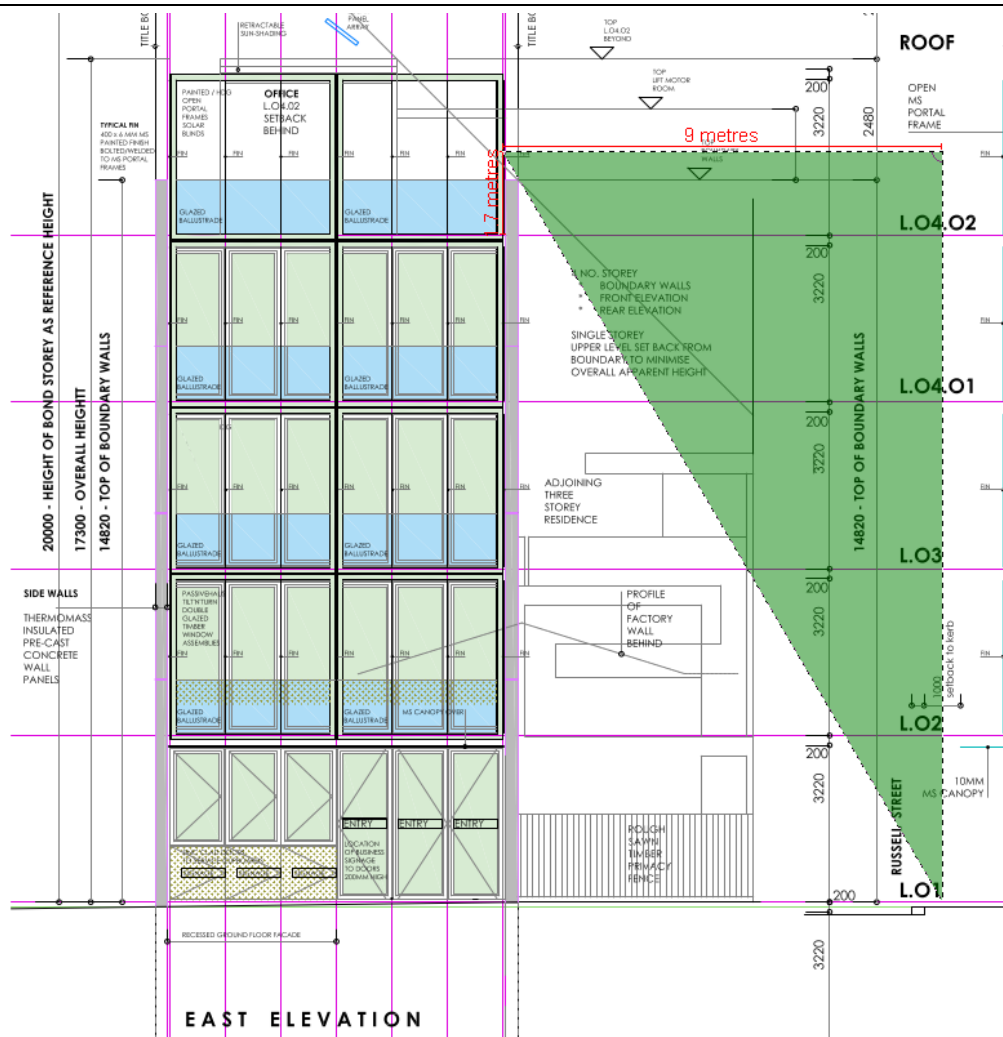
Overlooking within 9m of the northern perimeter of the fourth floor terrace.
